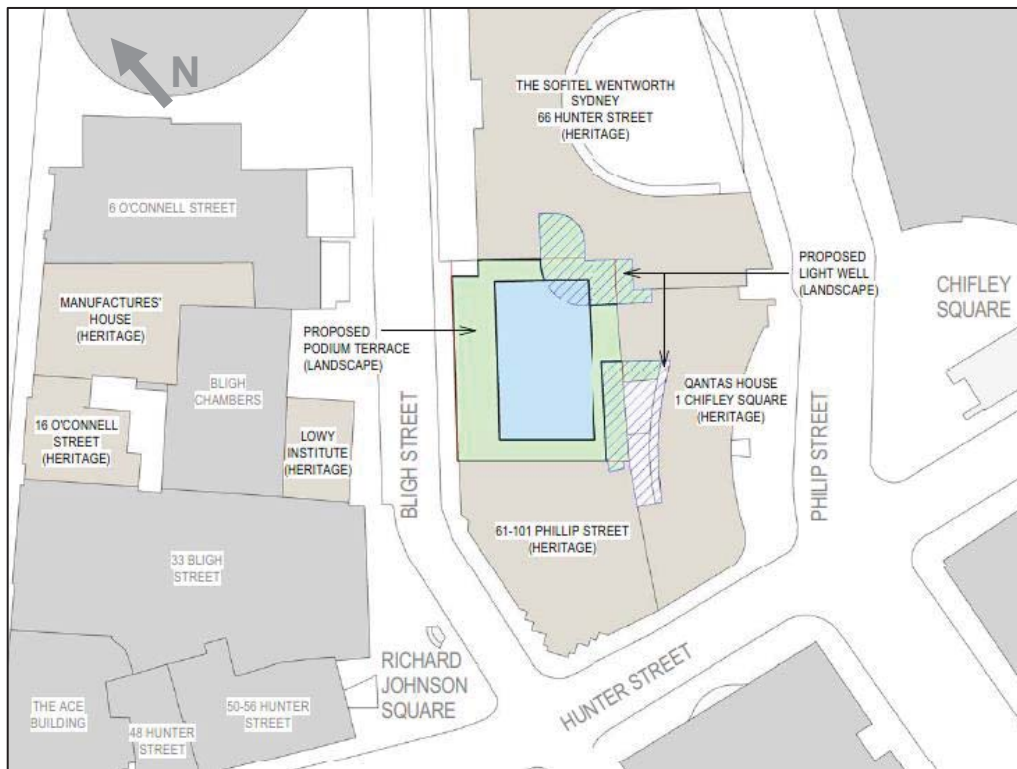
Heritage Buildings Surrounding 4-6 Bligh Street
